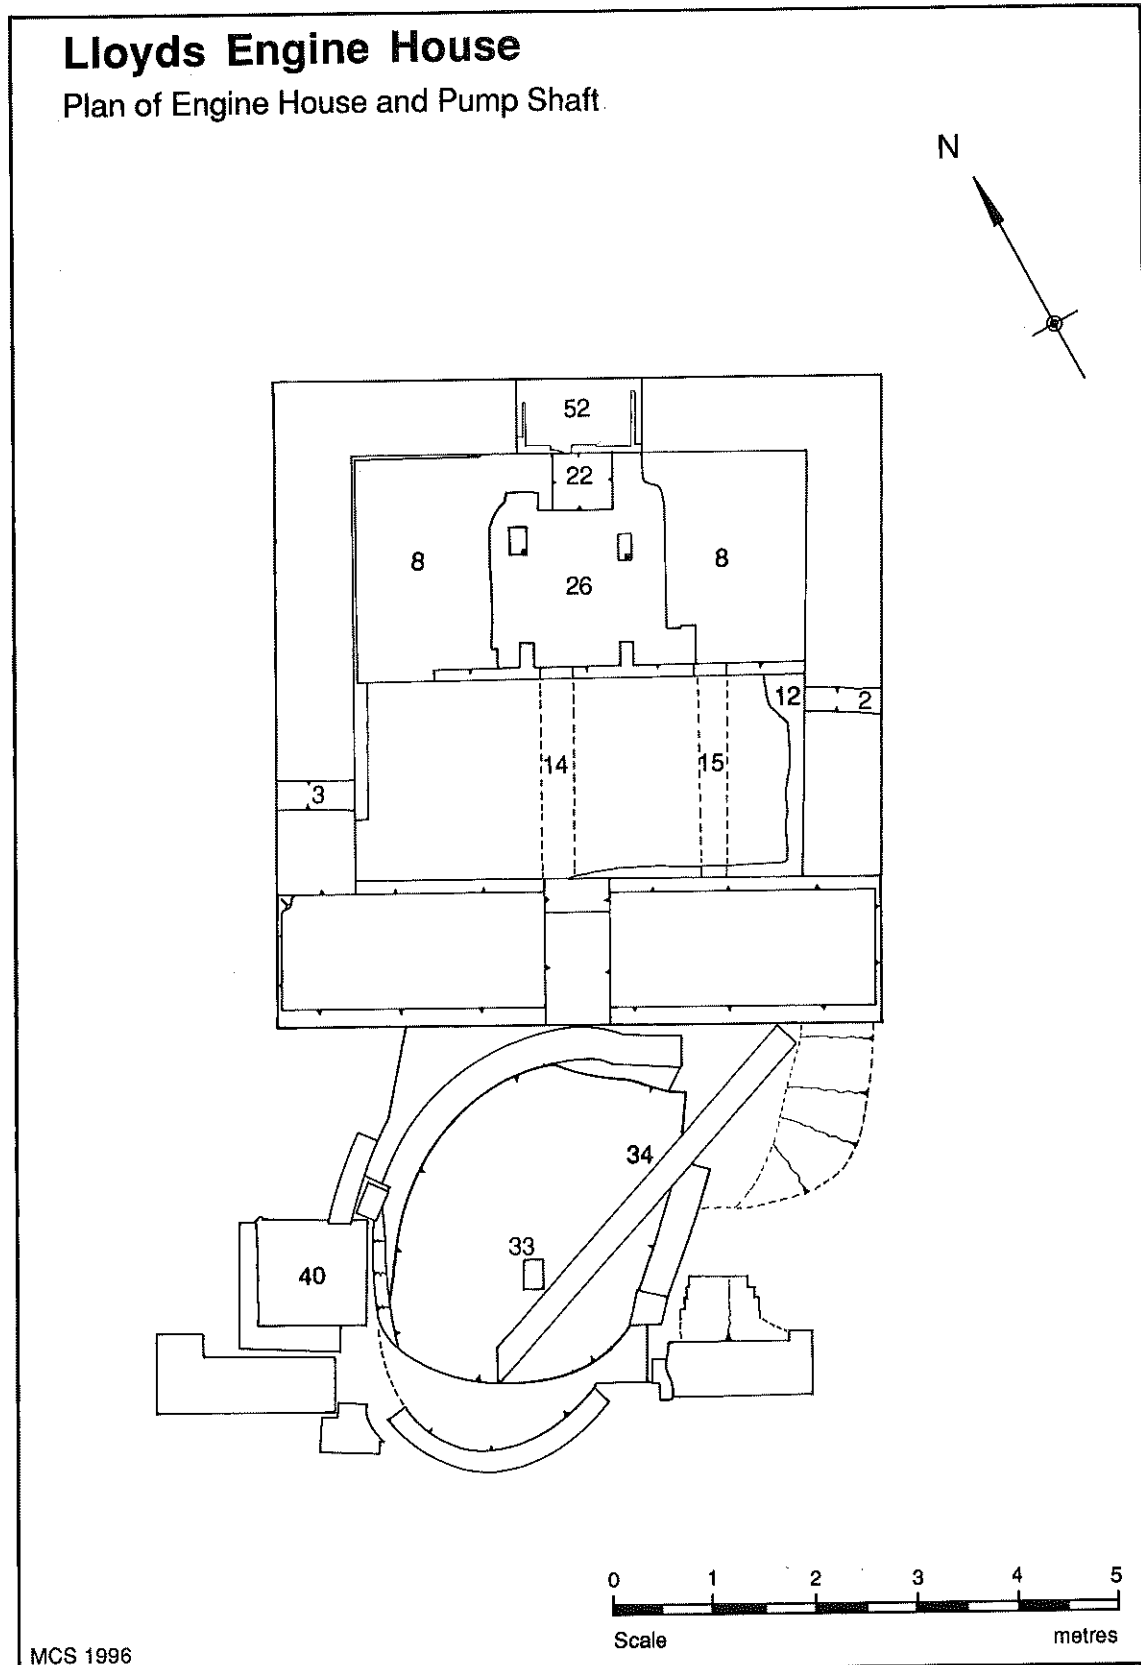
PLAN OF THE ENGINE HOUSE AND PUMP SHAFT
